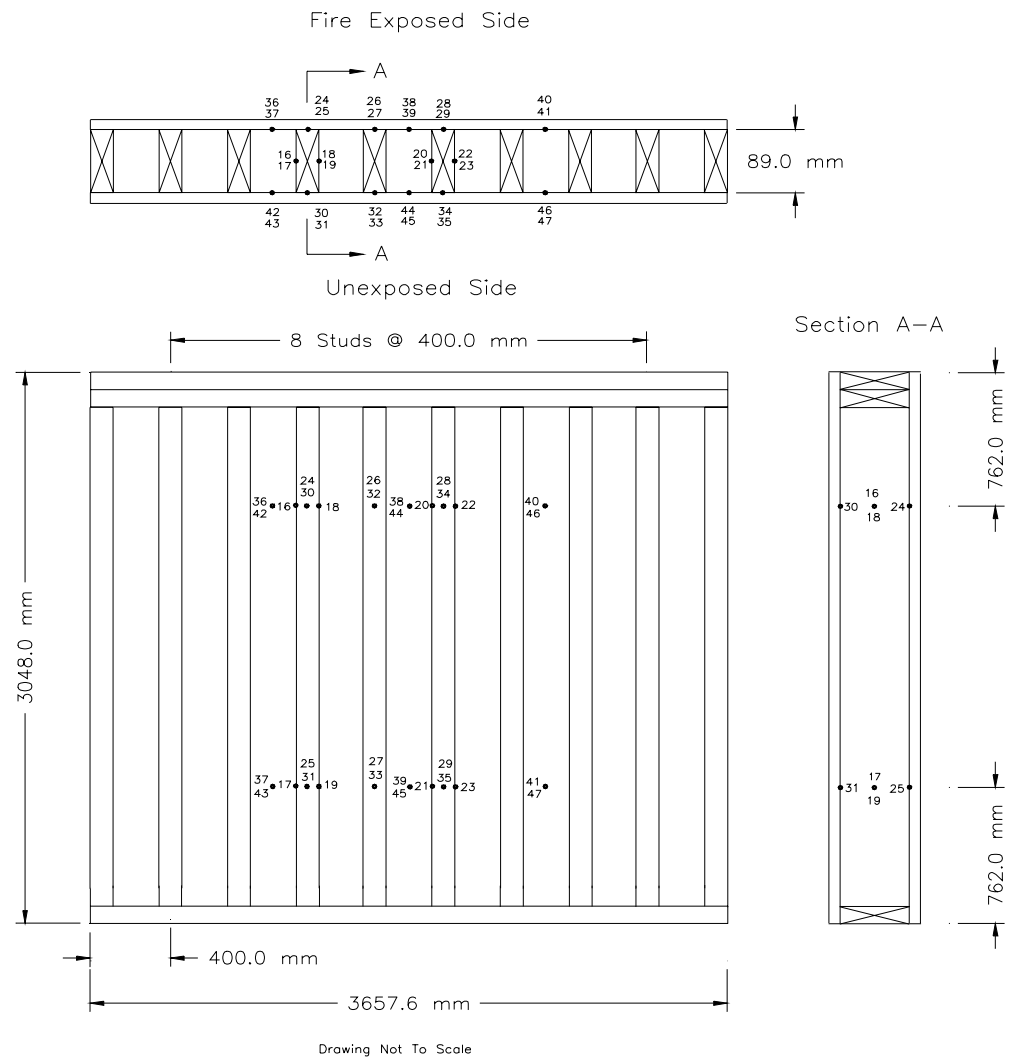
Thermocouple Locations in Full-Scale Test F-01B
